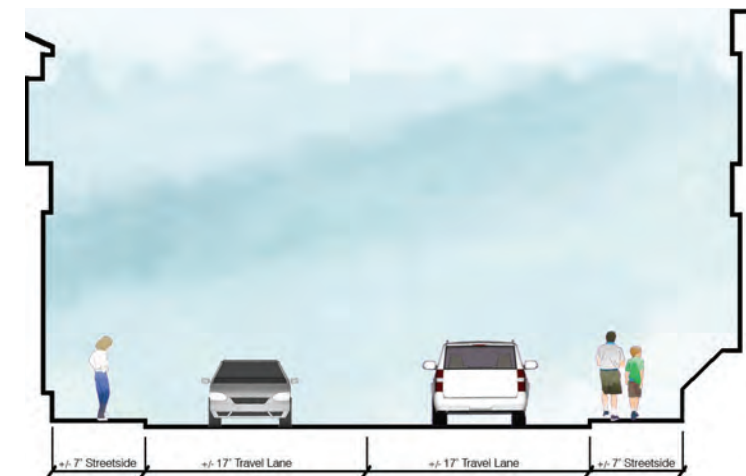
Jones Existing Cross Section – Avenue B to Camden
